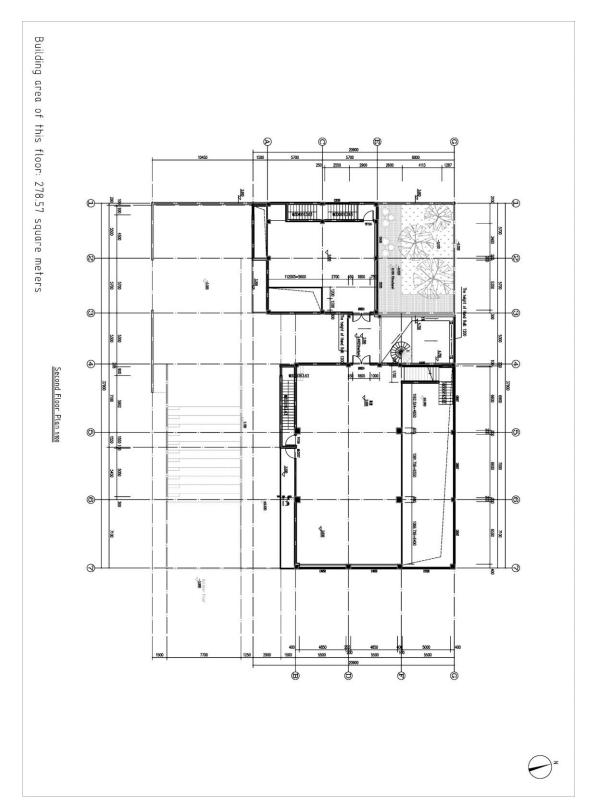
Second Floor Plan of Tourist Reception Center (Drawn by the author)
